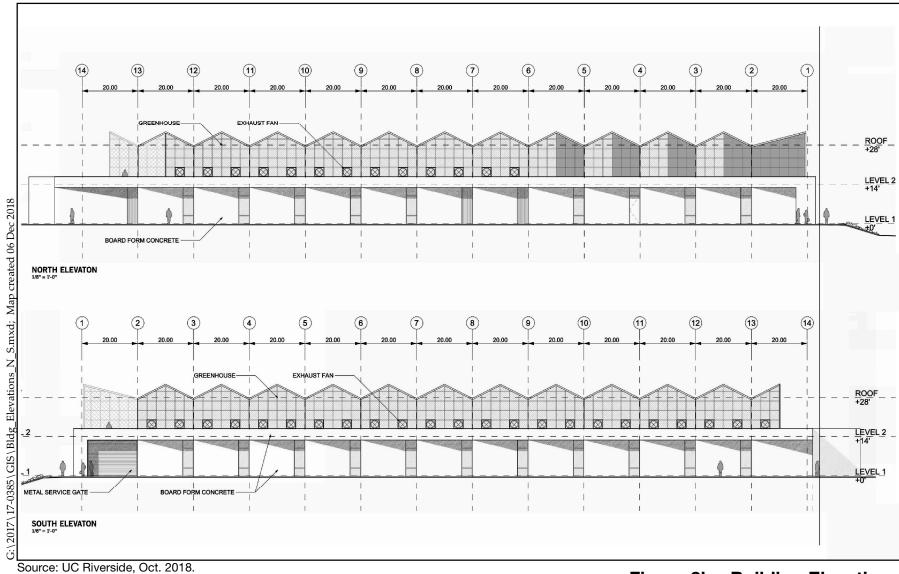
Building Elevations UCR Plant Growth Environments Facility
